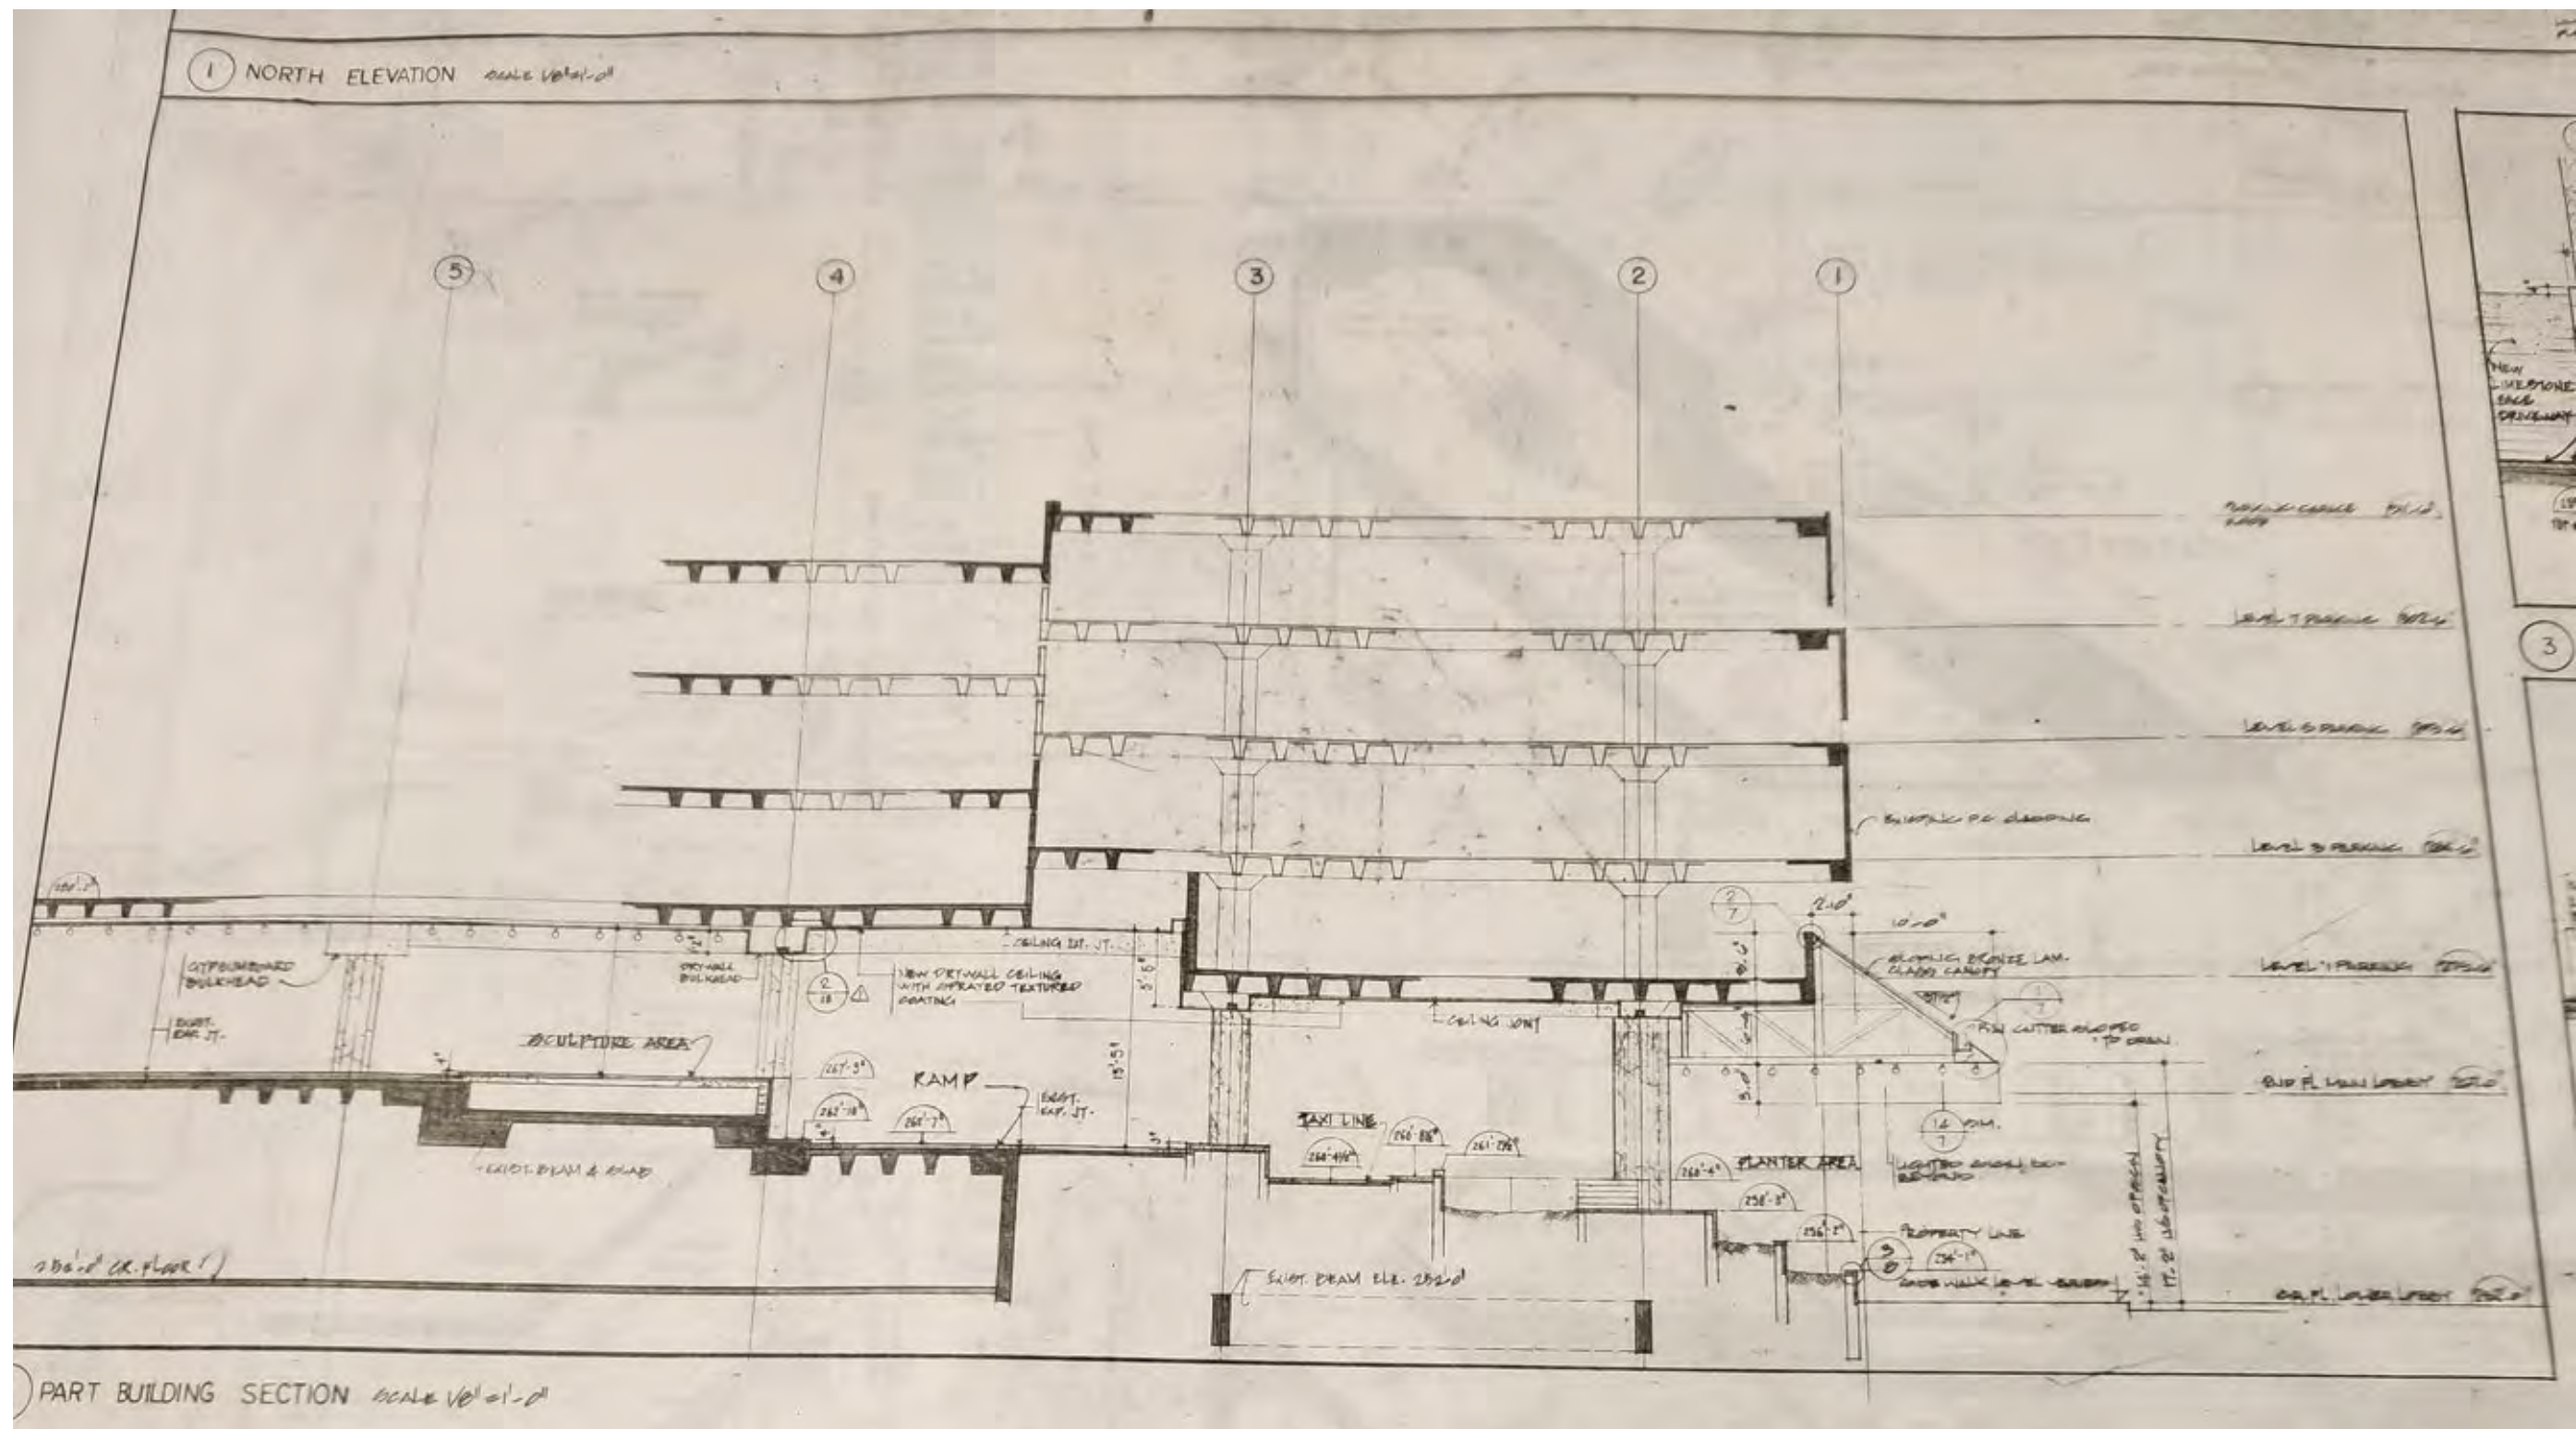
Detail of drawing showing section of east elevation and proposed changes to parking structure, c. 1982 (Webb Zerafa Menkes Housden Partnership Architects).
